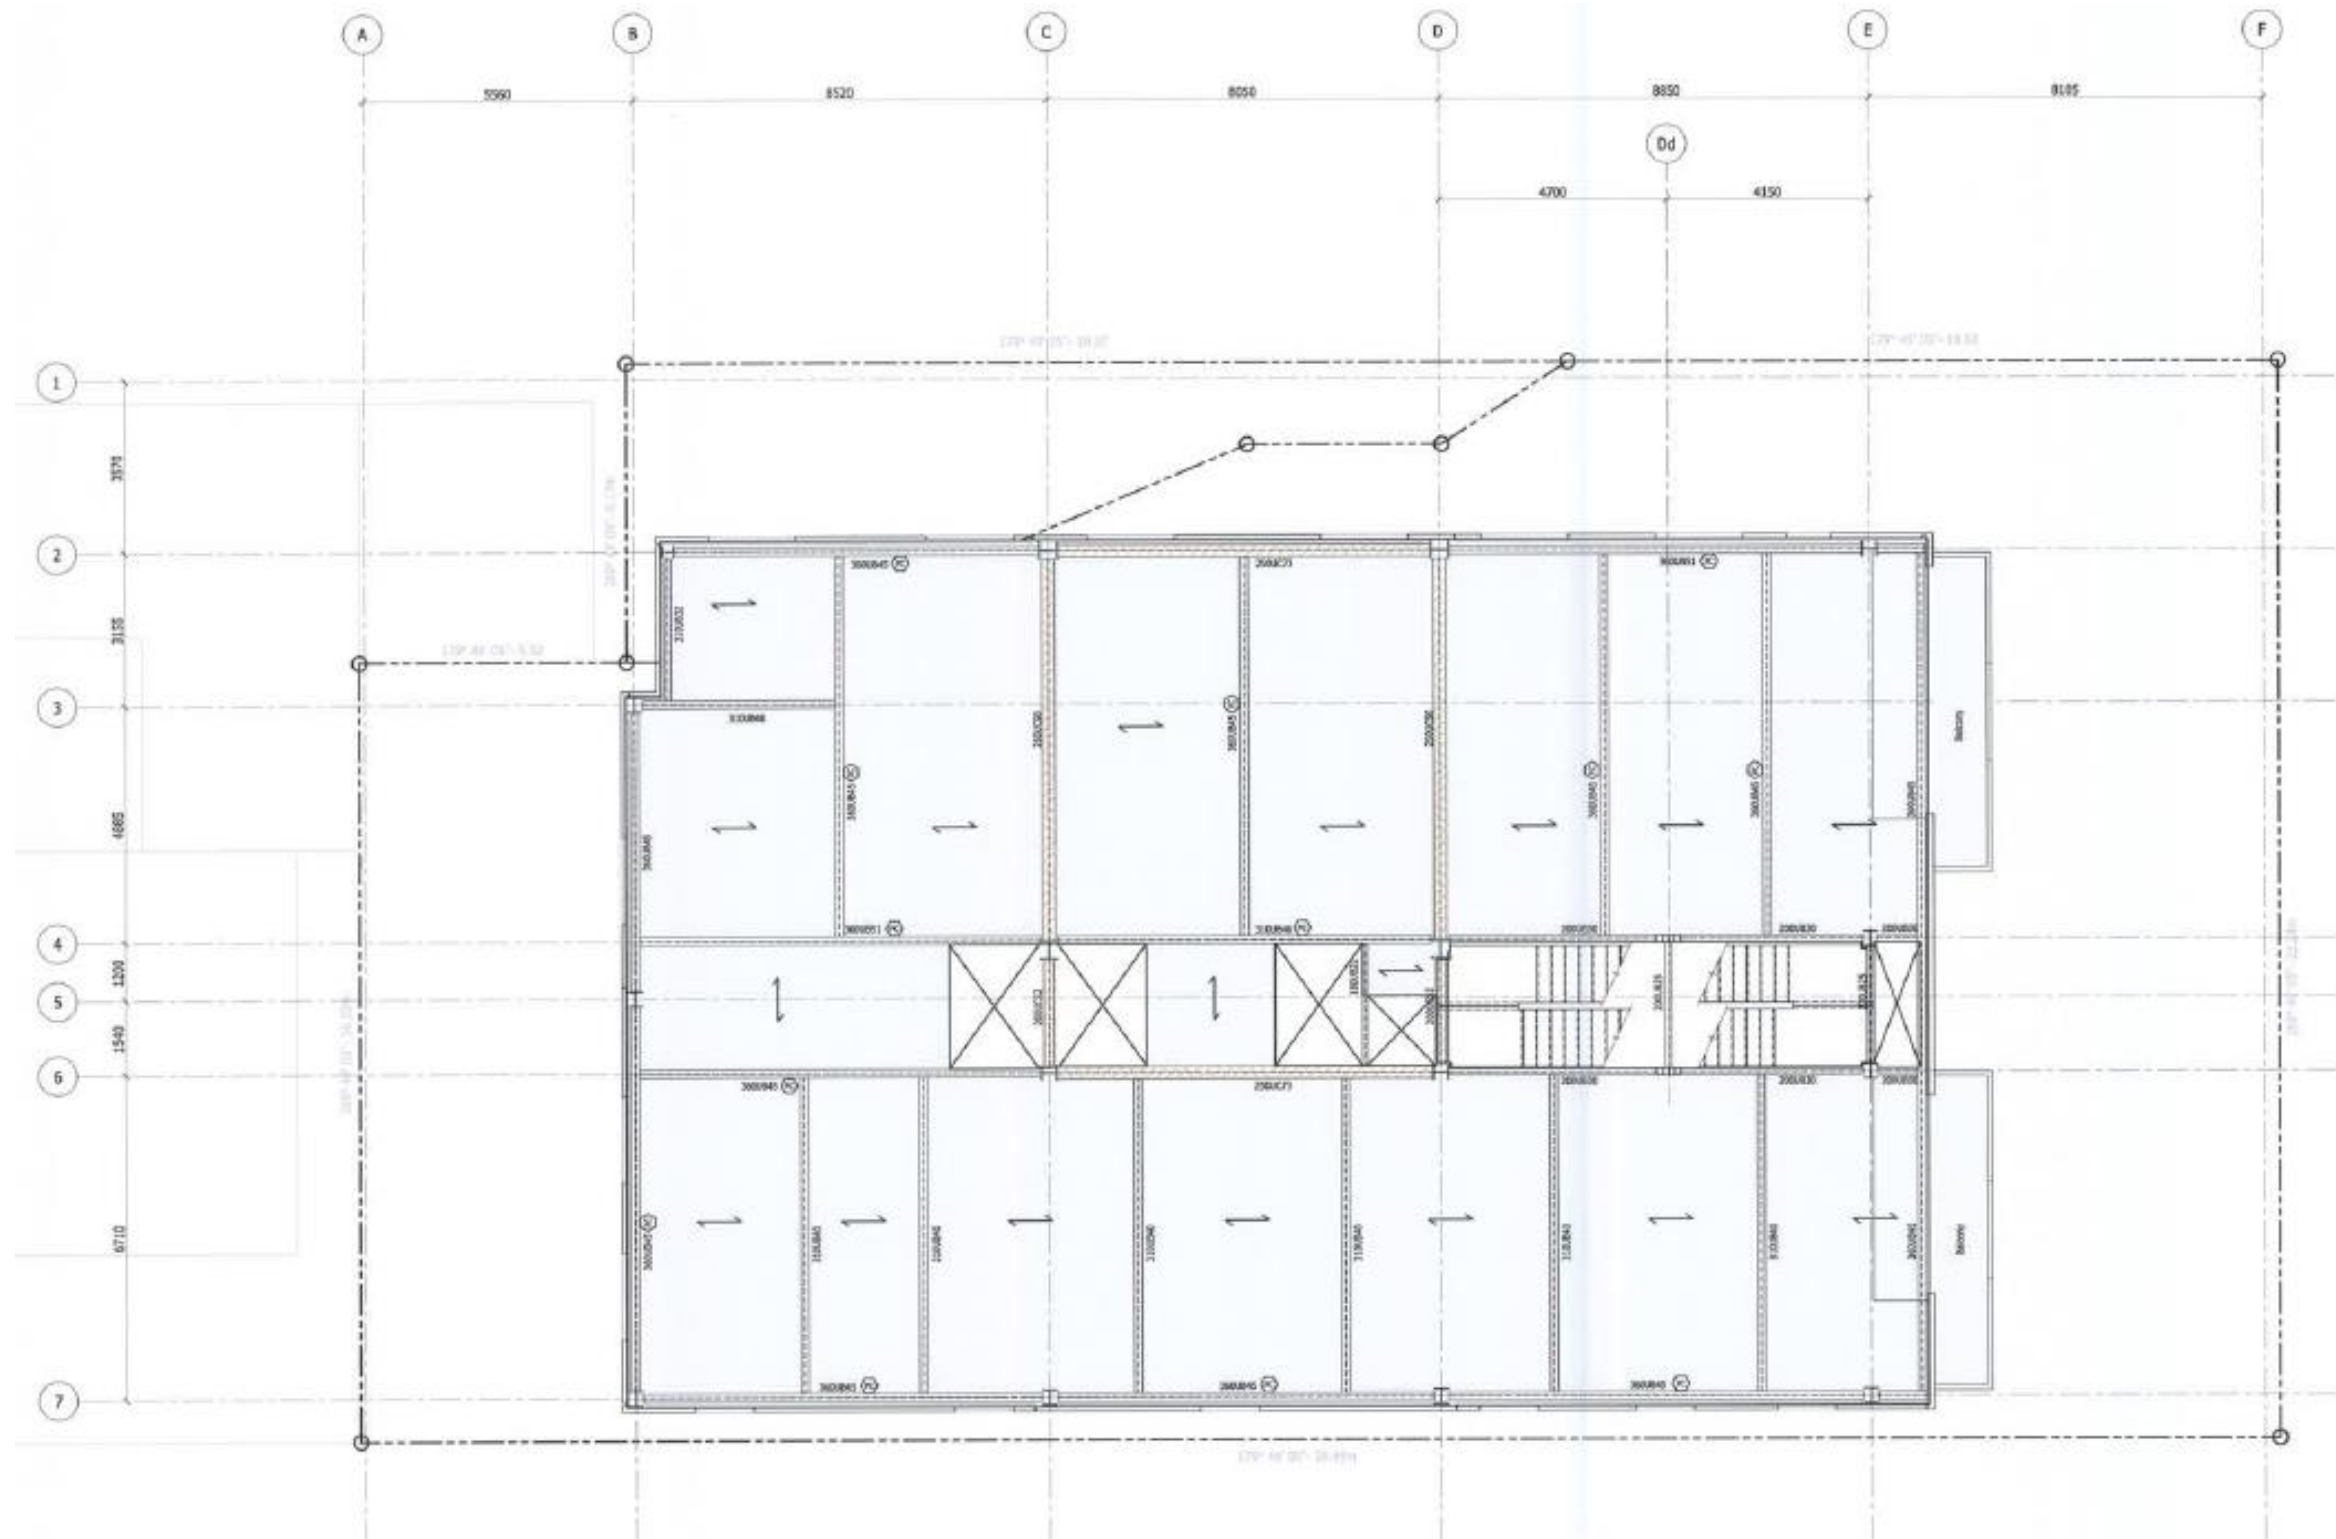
Structural Plan Level 15 (Christchurch City Council 2016c)
